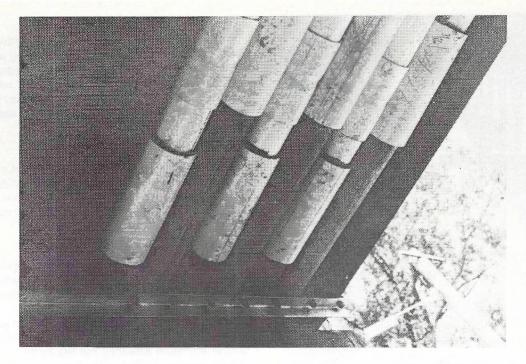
The Expansion Joints used as the Interface between the GI and PVC Conduits.
